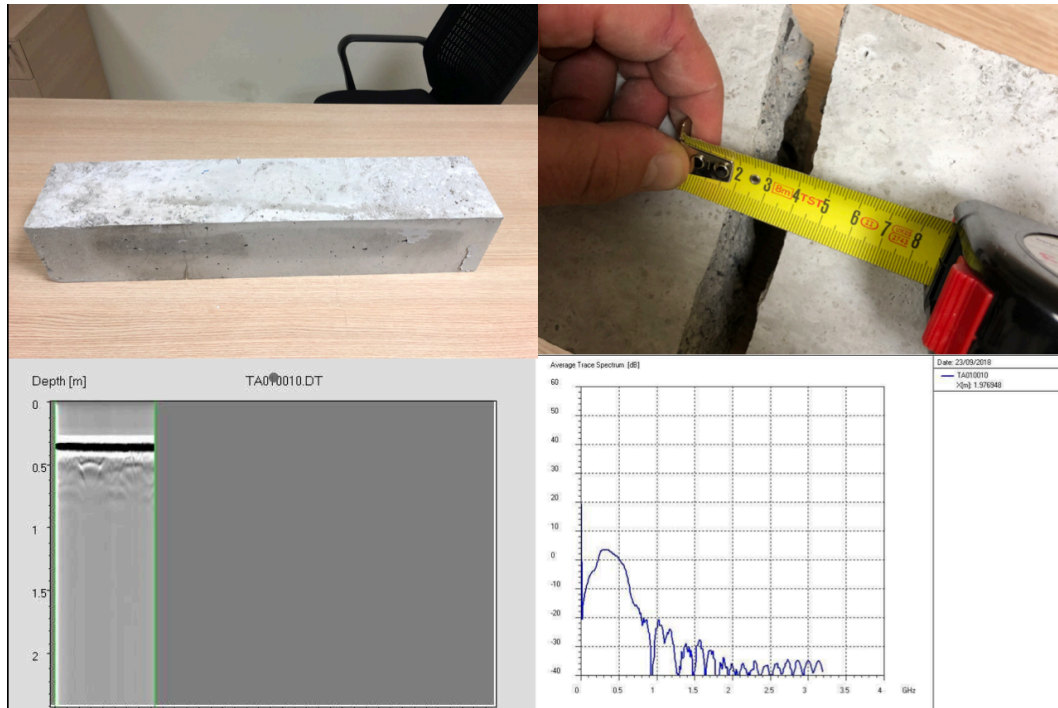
Concrete slab with 2cm crack, B-scan and average trace spectrum
